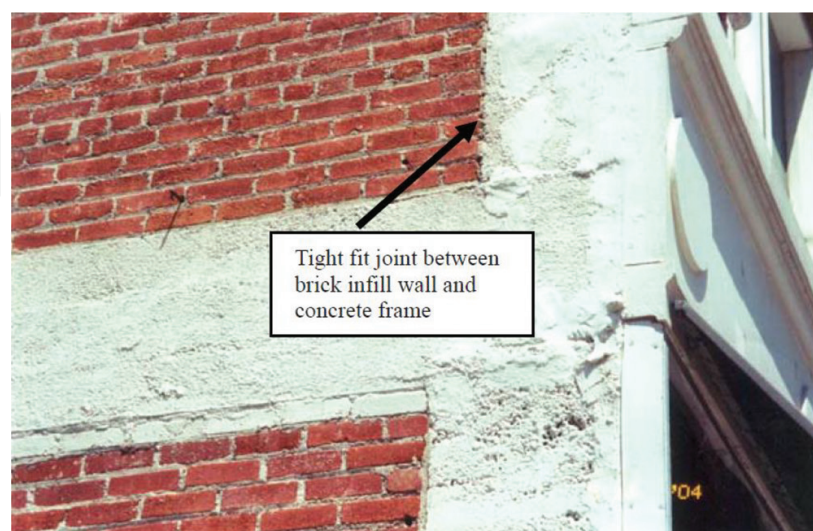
Example of a tight-fit masonry infill wall construction [Photo by Ali M. Memari].
